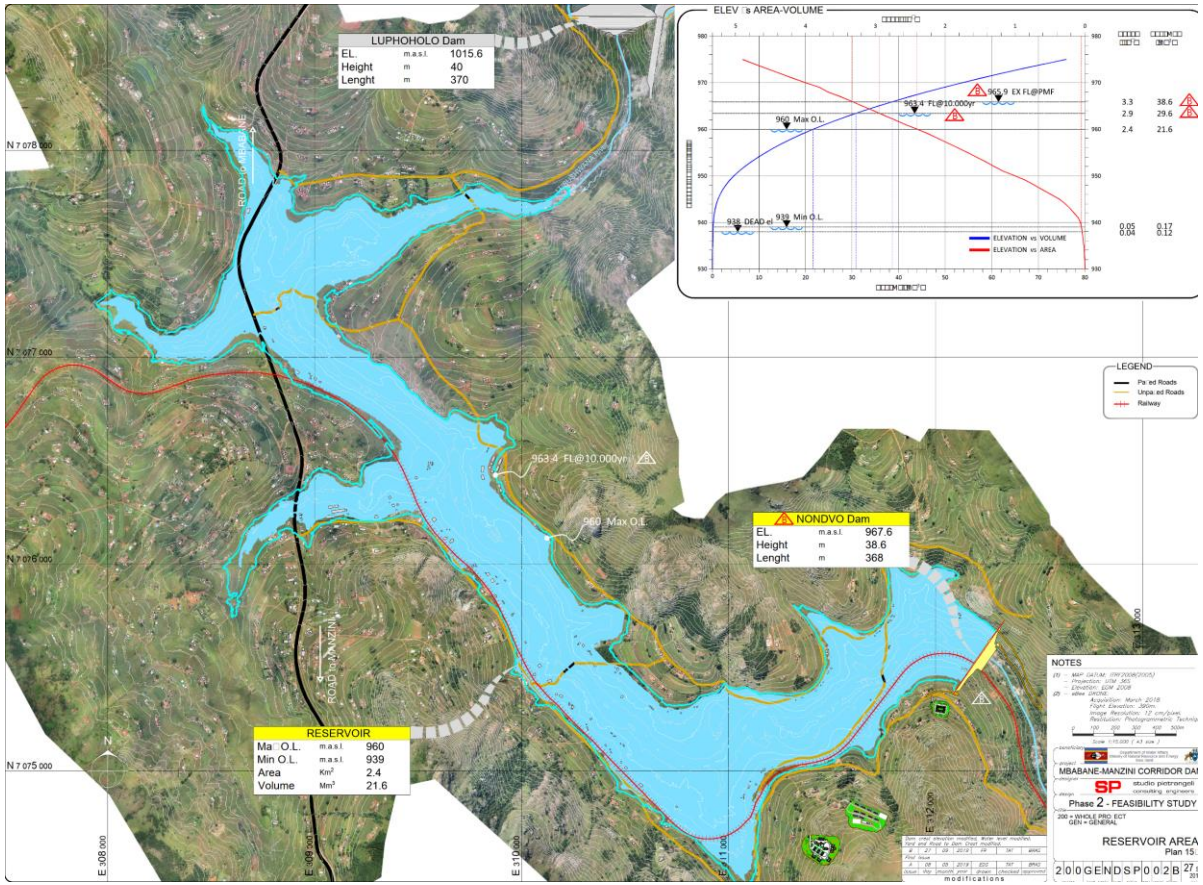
Layout showing the dam wall and reservoir area along with associated infrastructure
